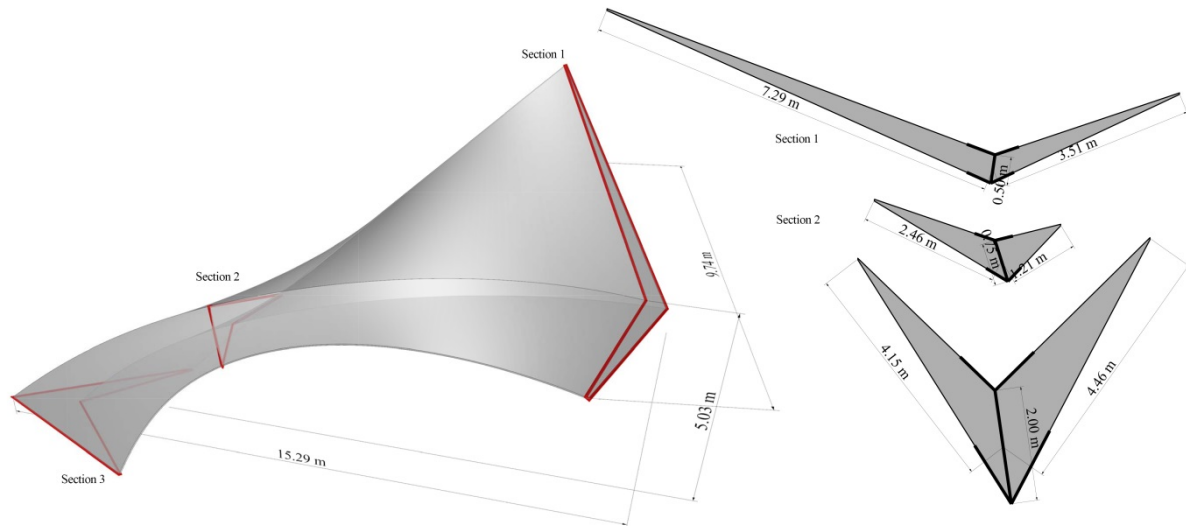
Diving Arch and its cross-sections with the mid-rib as a load bearing I-beam.
